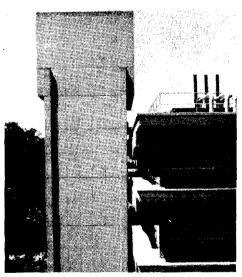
The Health Sciences Building, at the U.C. San Francisco Medical Center, shows how a complex plan is divided into independent units.
